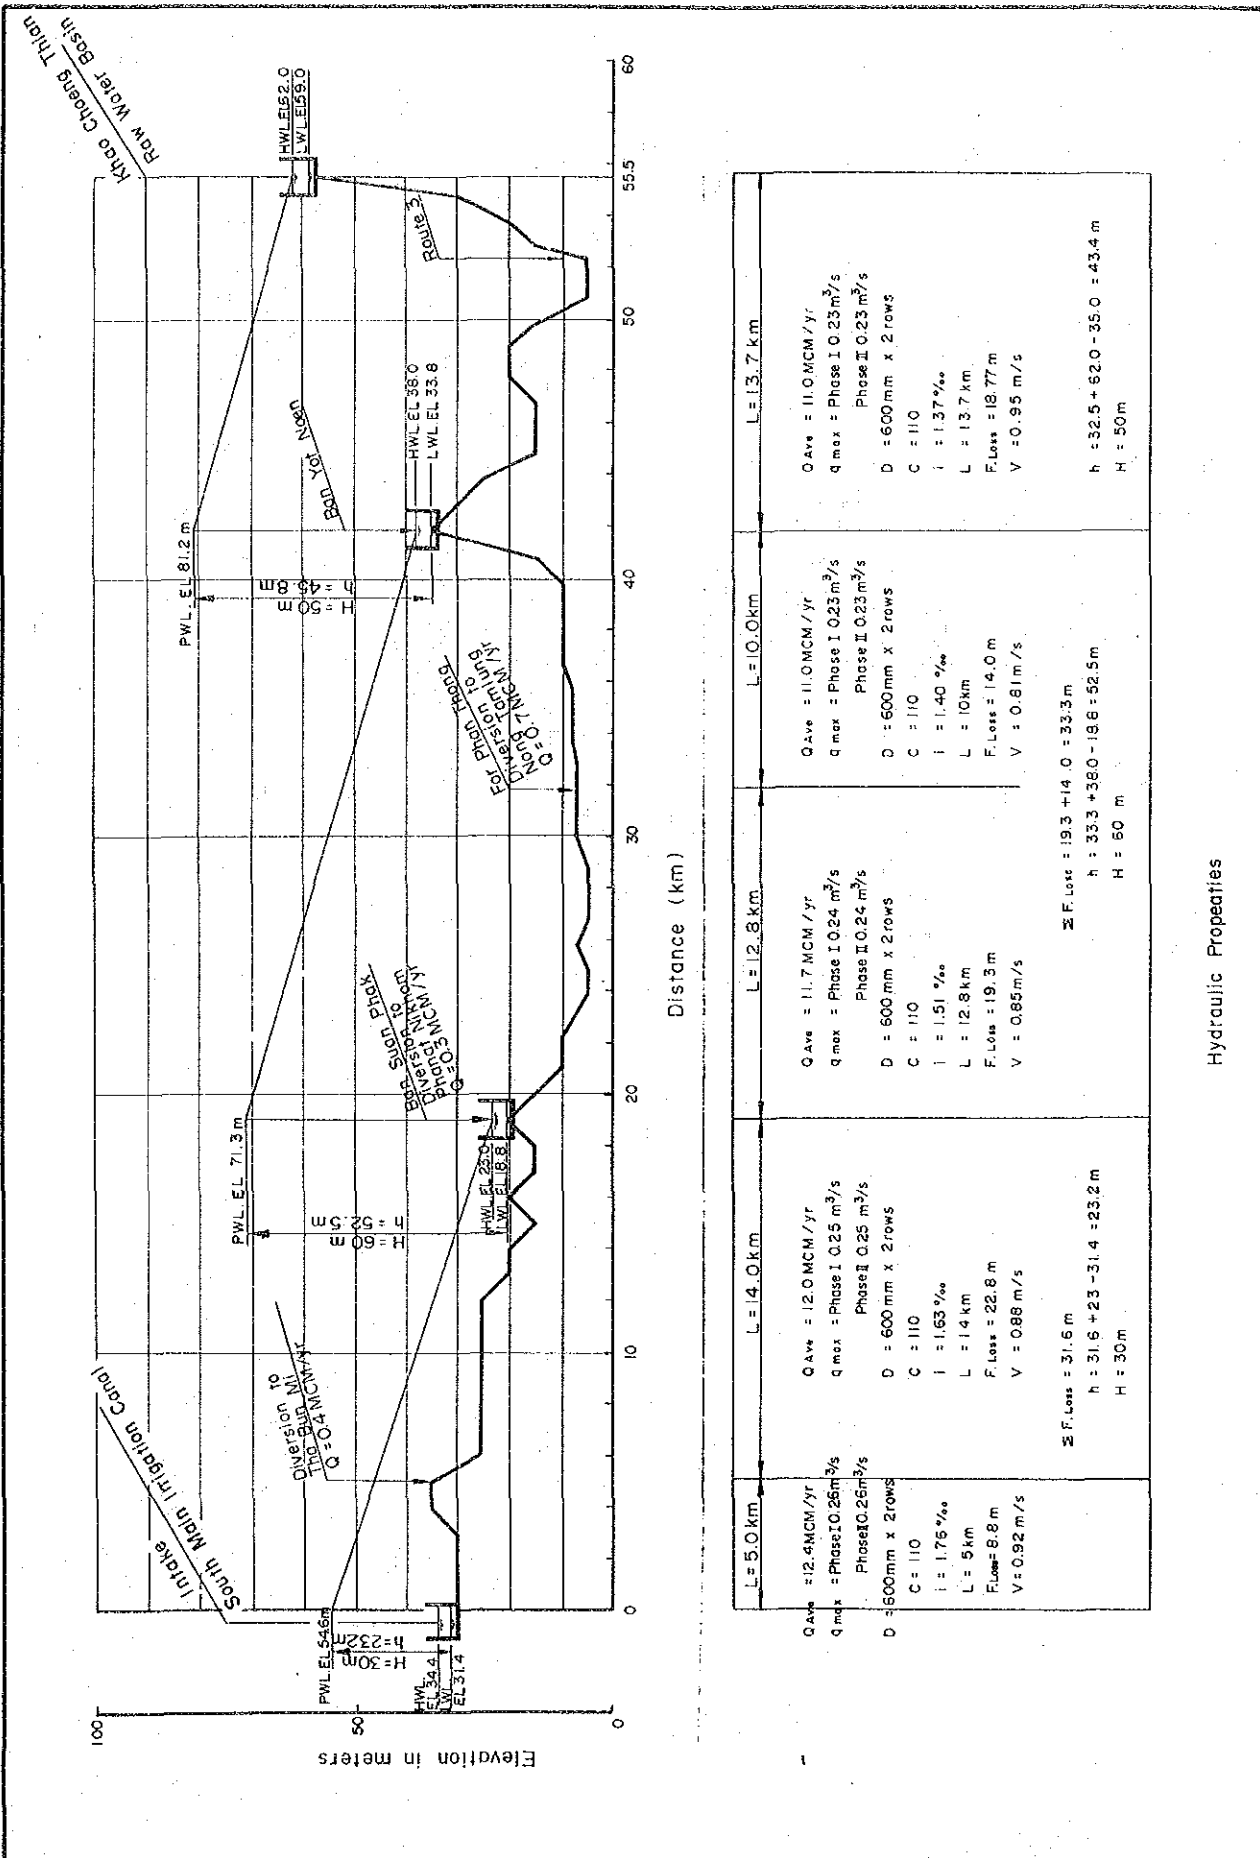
Hydraulic Design of Proposed Plan, Khlong Luang System
